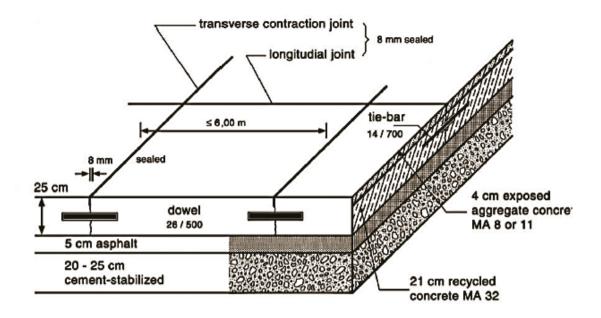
Cross-section of Austrian JPCP construction. (Hall et. al., 2007)
